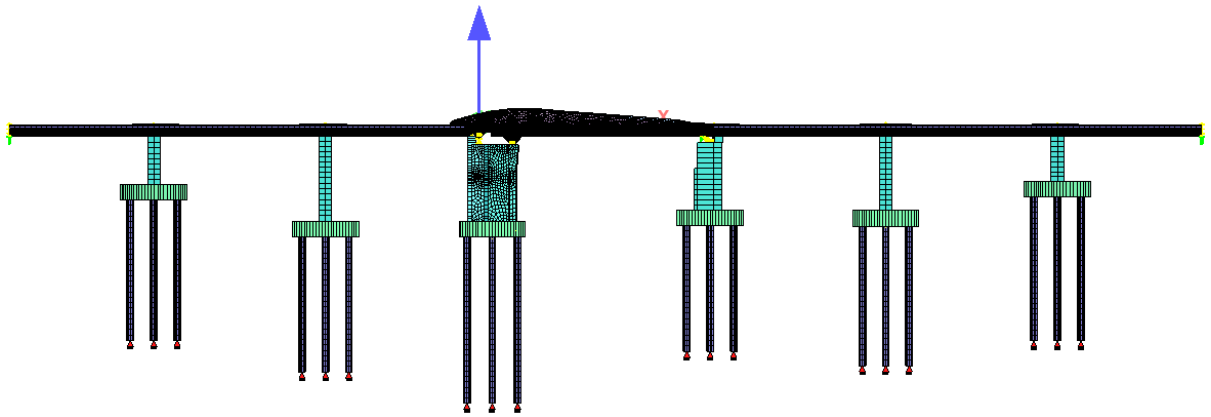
SBR Global Model – Elevation view with Lift Span deck in closed position (open to vehicle traffic)
